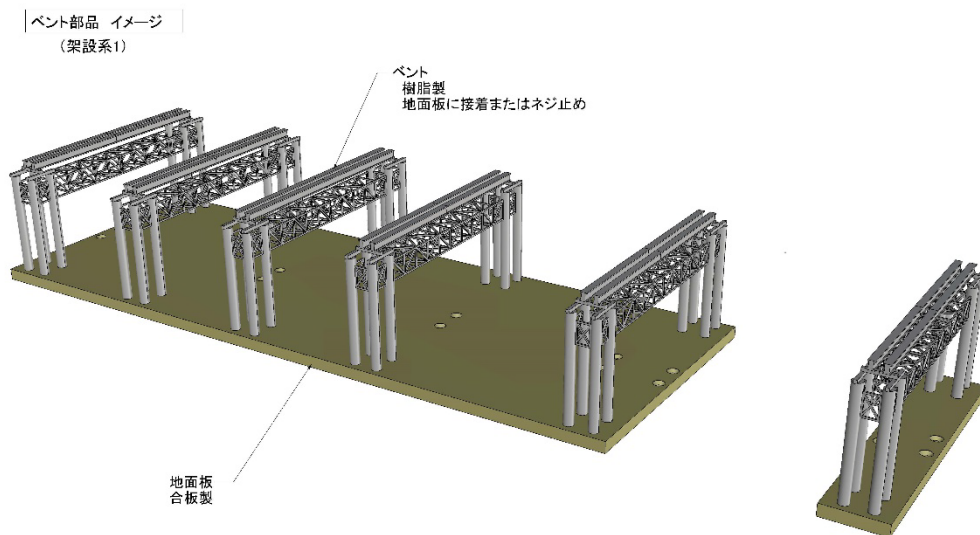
3-D image of the bents (The bents are installed to reproduce the under construction stage before the lowest cable being installed and just after the first segment of the main girder was installed.)
